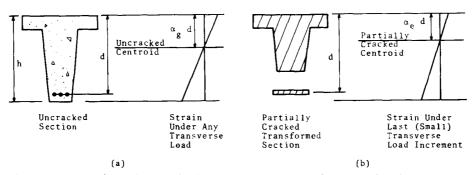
Location of centroidal axes (same as neutral axes under the transverse loading conditions shown) for both uncracked and partially cracked sections of either nonprestressed or prestressed concrete members
